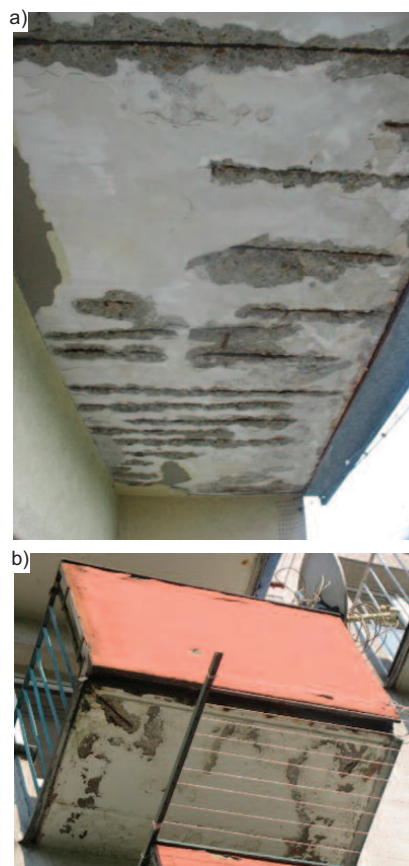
Damage to cantilever galleries, caused by the lack of timely repairs and renovations: a) damage to the terrazzo floor; b) catastrophic condition of the gallery
